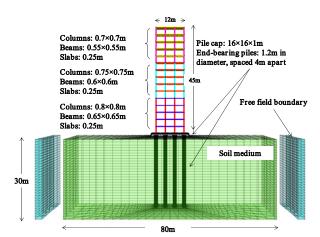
Adopted designed moment resisting building resting on endbearing pile foundation and soil system
